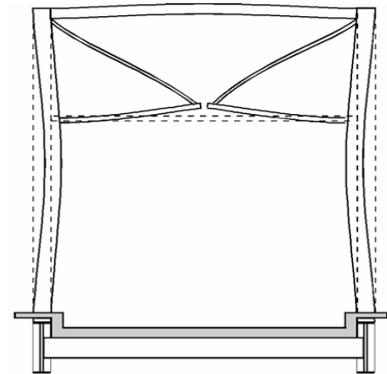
8 Impact Damage to Truss Bridge
